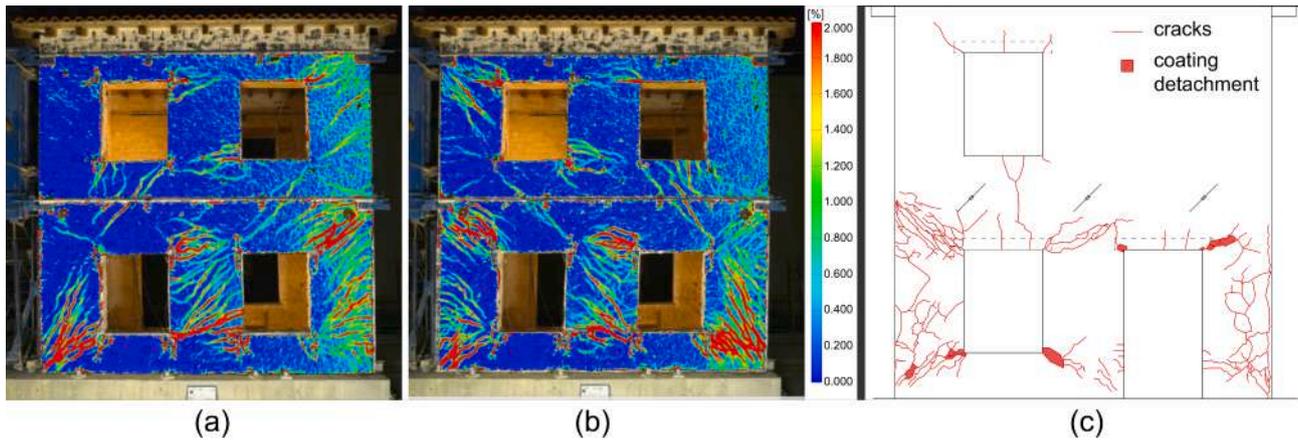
RM building: cracks (maximum strains) on the East wall at the end of the test, detected by the DIC System for negative N-S (a) and positive S-N (b) loading directions, and crack configuration on the West wall (c).
